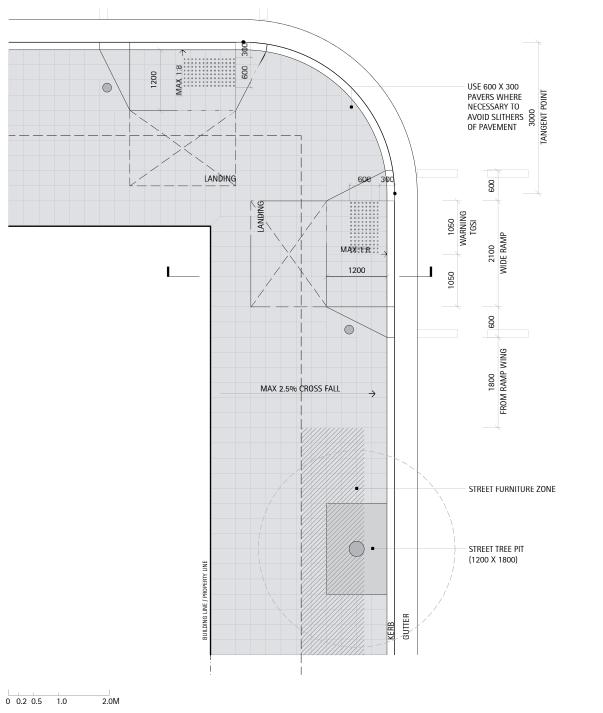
Streets Corner Plan: 3000 Radius 2100 Ramp
